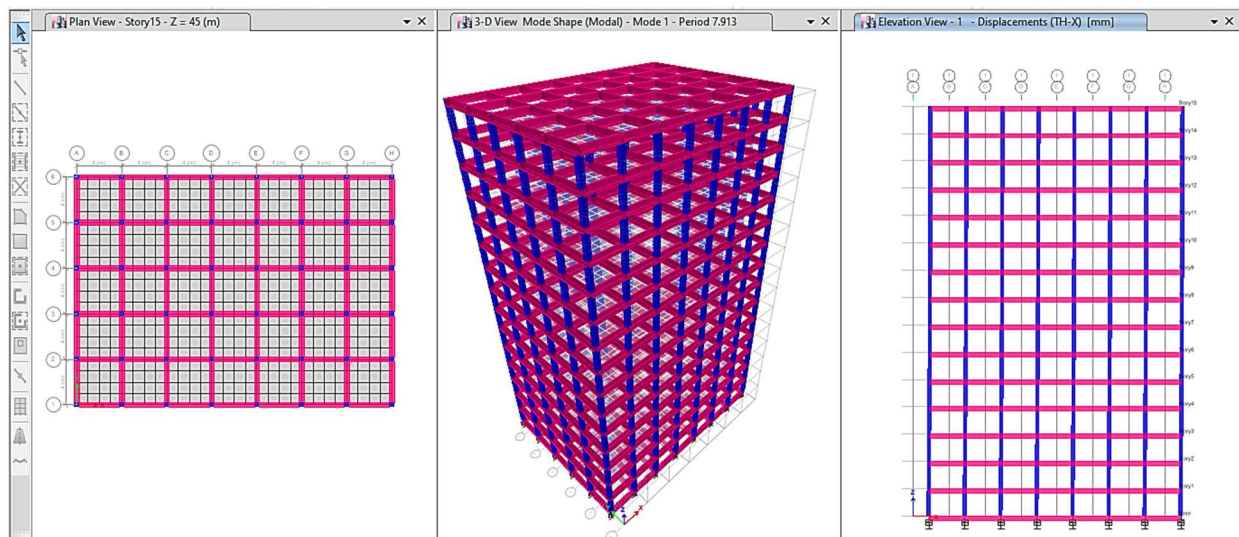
Plan, 3D & Elevation view of LRB base rectangular plan building
